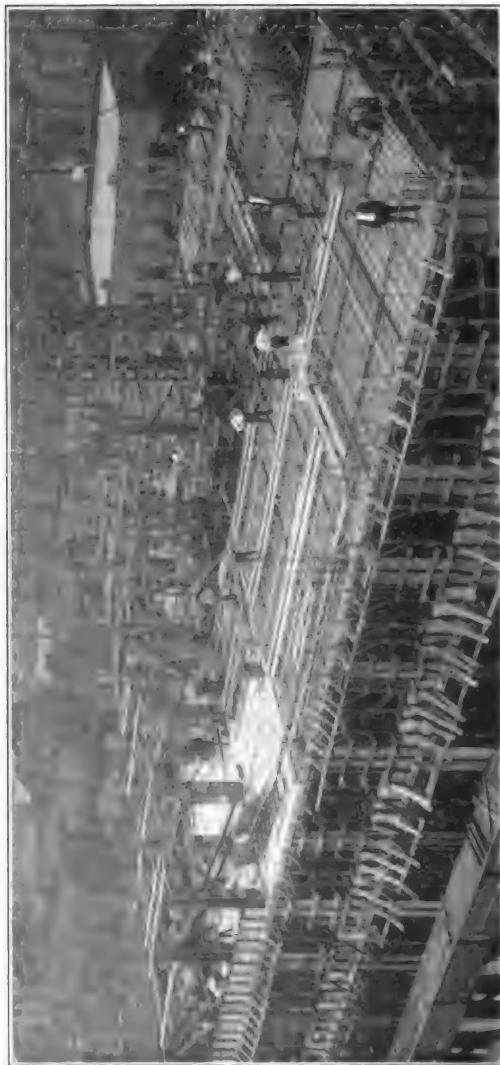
Phelps Publishing Co.'s building, Springfield, Mass.
